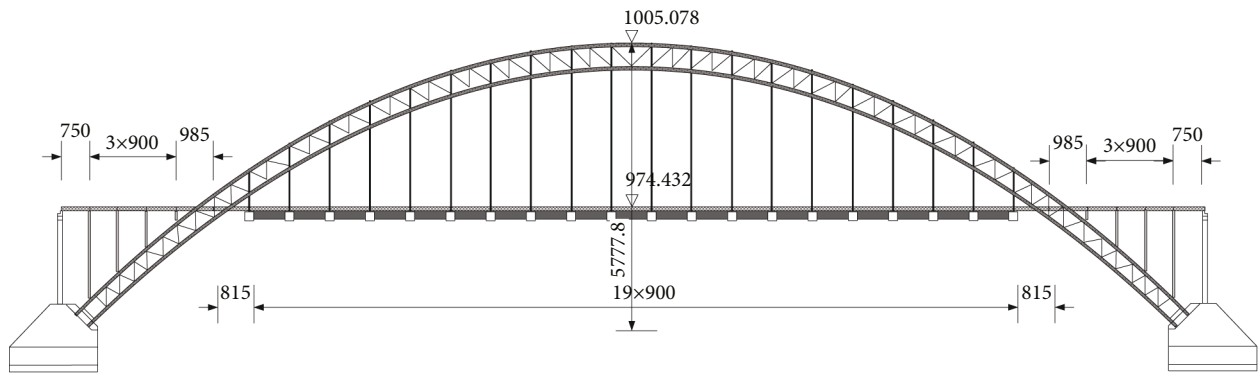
Bridge elevation structure drawing (unit: cm).
